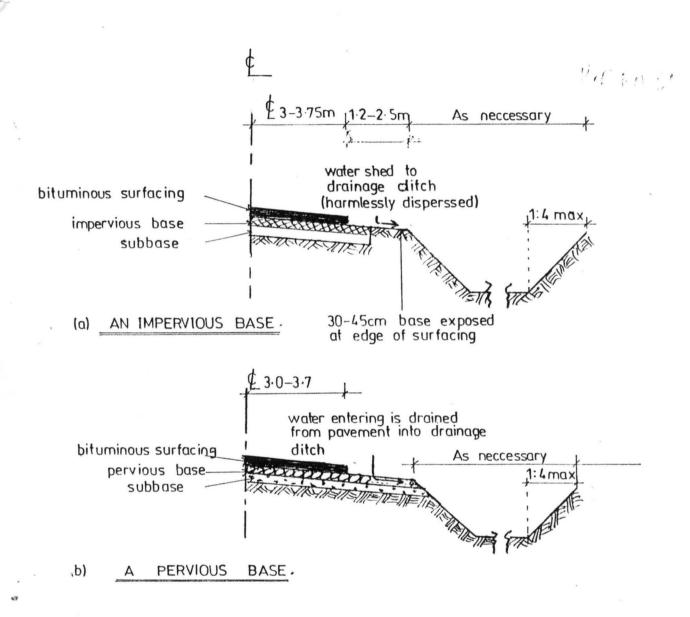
DRAINAGE OF PAVEMENT LAYERS Ref RN 31
